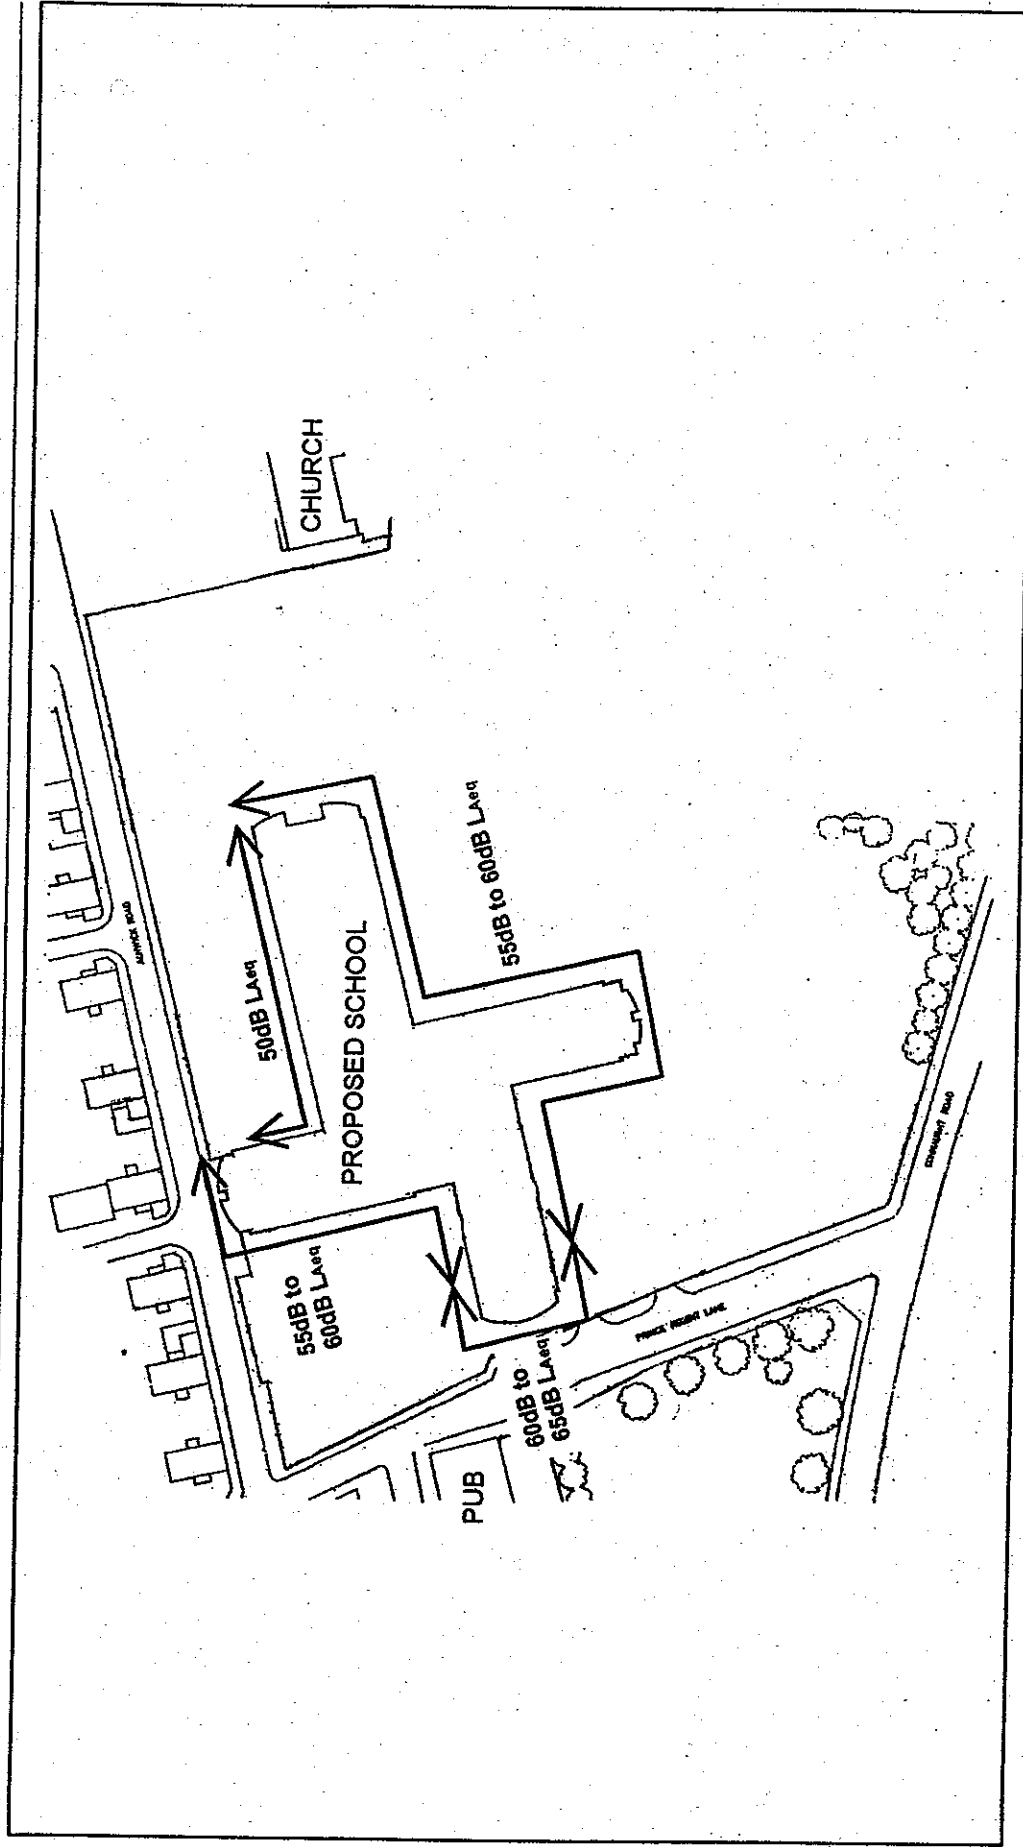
Proposed Building Plan with External Free-Field Road Traffic Noise Levels
